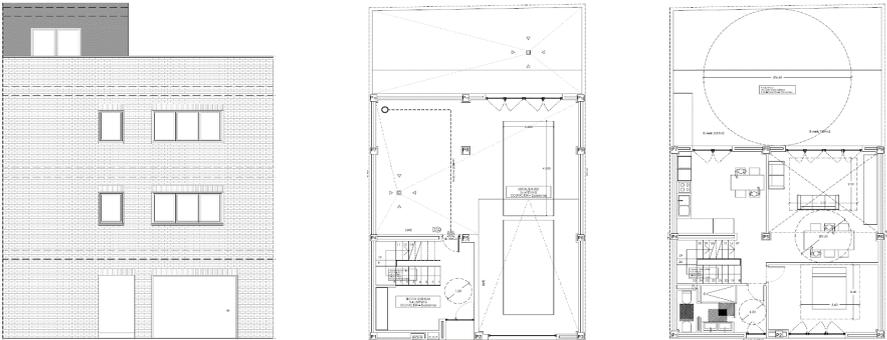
Plans of the house part 1: entry elevation and first and second floor section. Source: Own source
